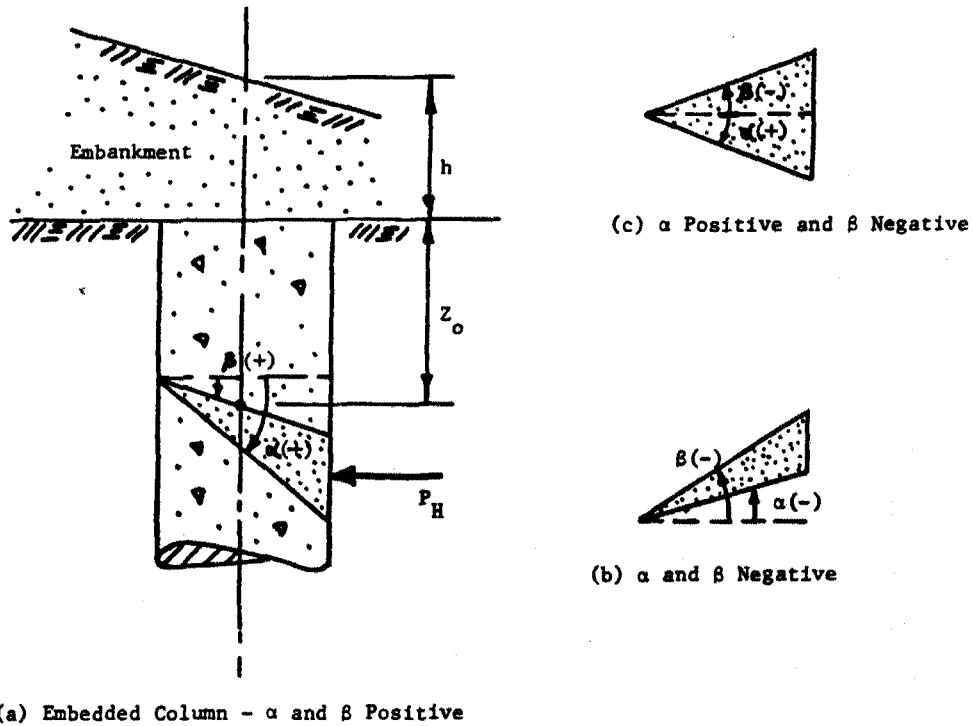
NOTATION USED IN FORMULAS FOR LOCAL BEARING FAILURE OF A STONE COLUMN.
